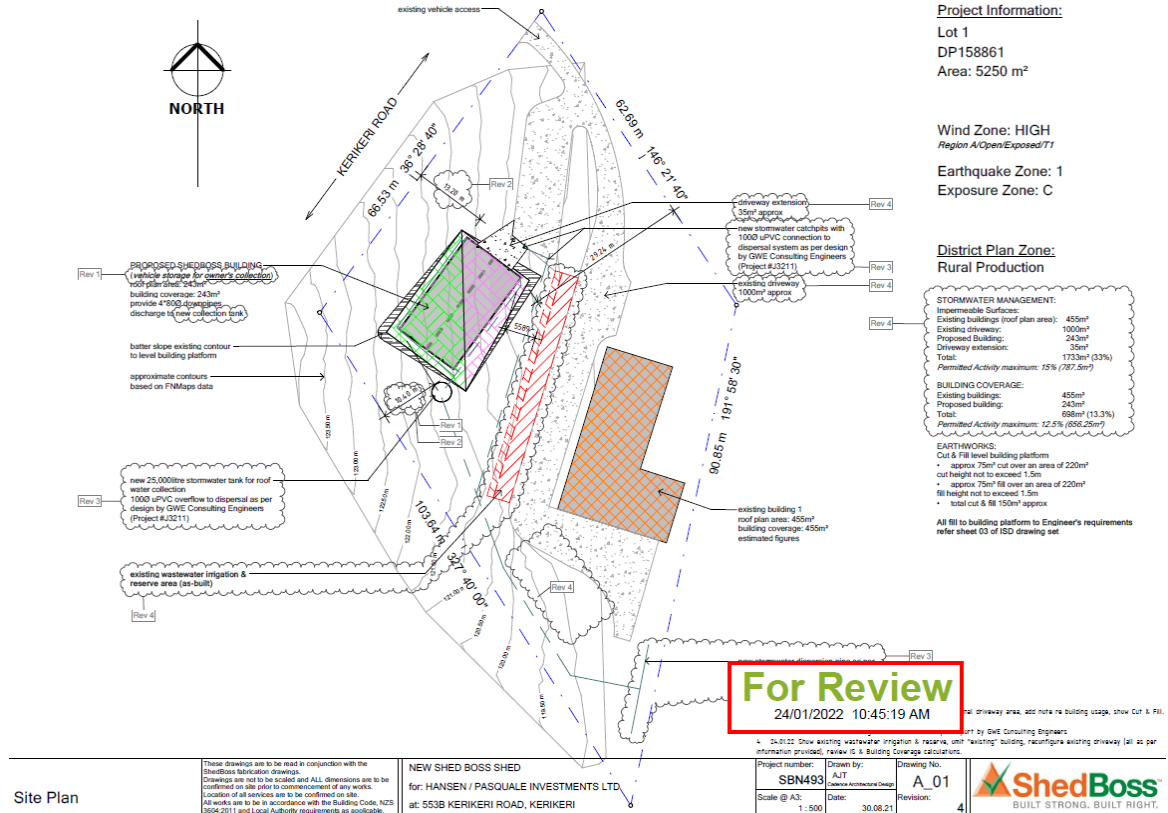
Site Plan for 553B Kerikeri Road, Kerikeri.
